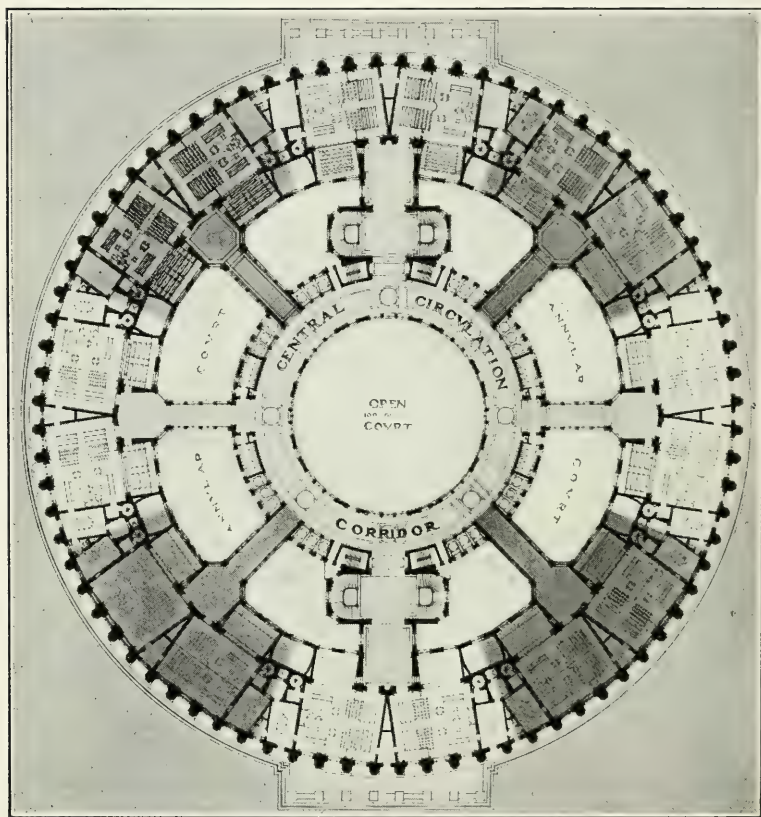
Architects' typical court room plan, No. 3, new County Court House, New York City, showing by shading the grouping of court rooms into separate units.
